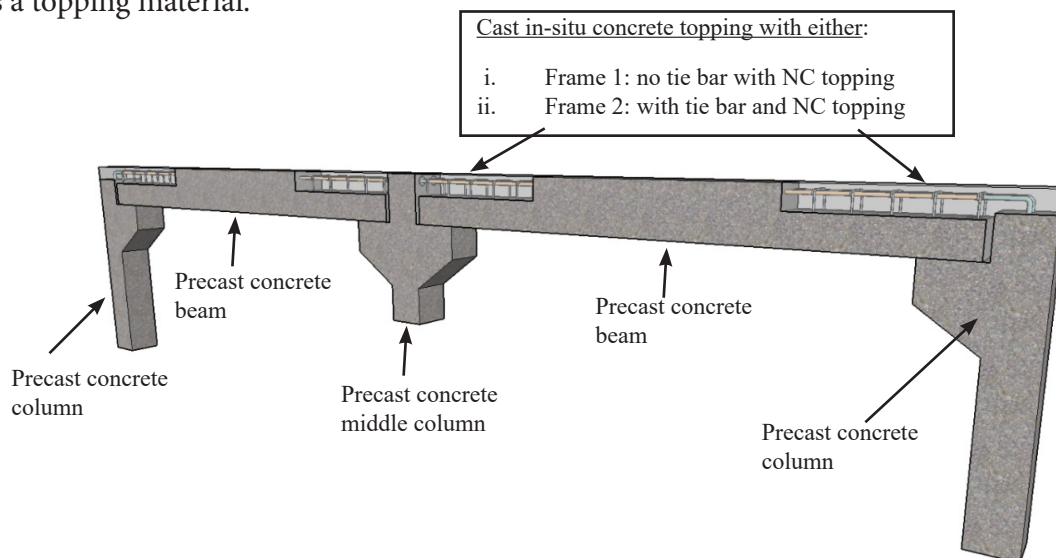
The schematic representation of precast concrete beam-column with cast in-situ concrete topping at joint.
